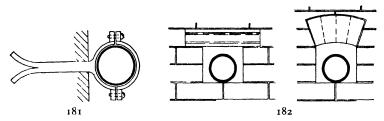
Malleable iron pipe bracket or batting band. Fig. 182. Steel joist or lintel and relieving arch carrying wall over drain pipe.
